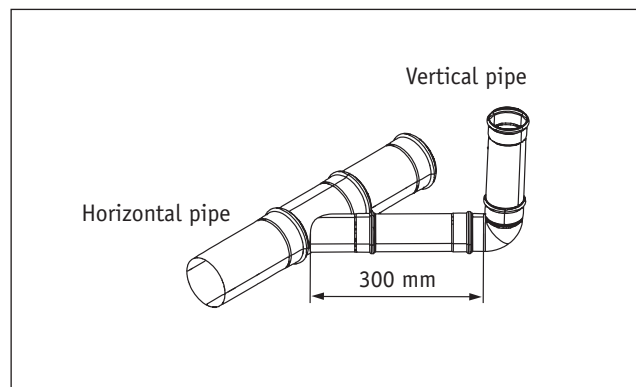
For greater heights of fall and loadings, the vertical pipe should be connected via a straight horizontal pipe with a length of at least 0.3 m (side connection).
